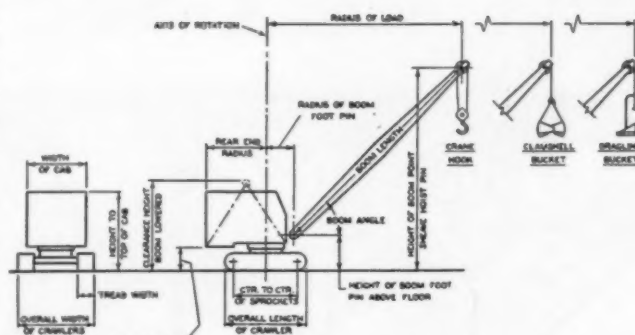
Lifting Crane, Clamshell and Dragline Excavators
